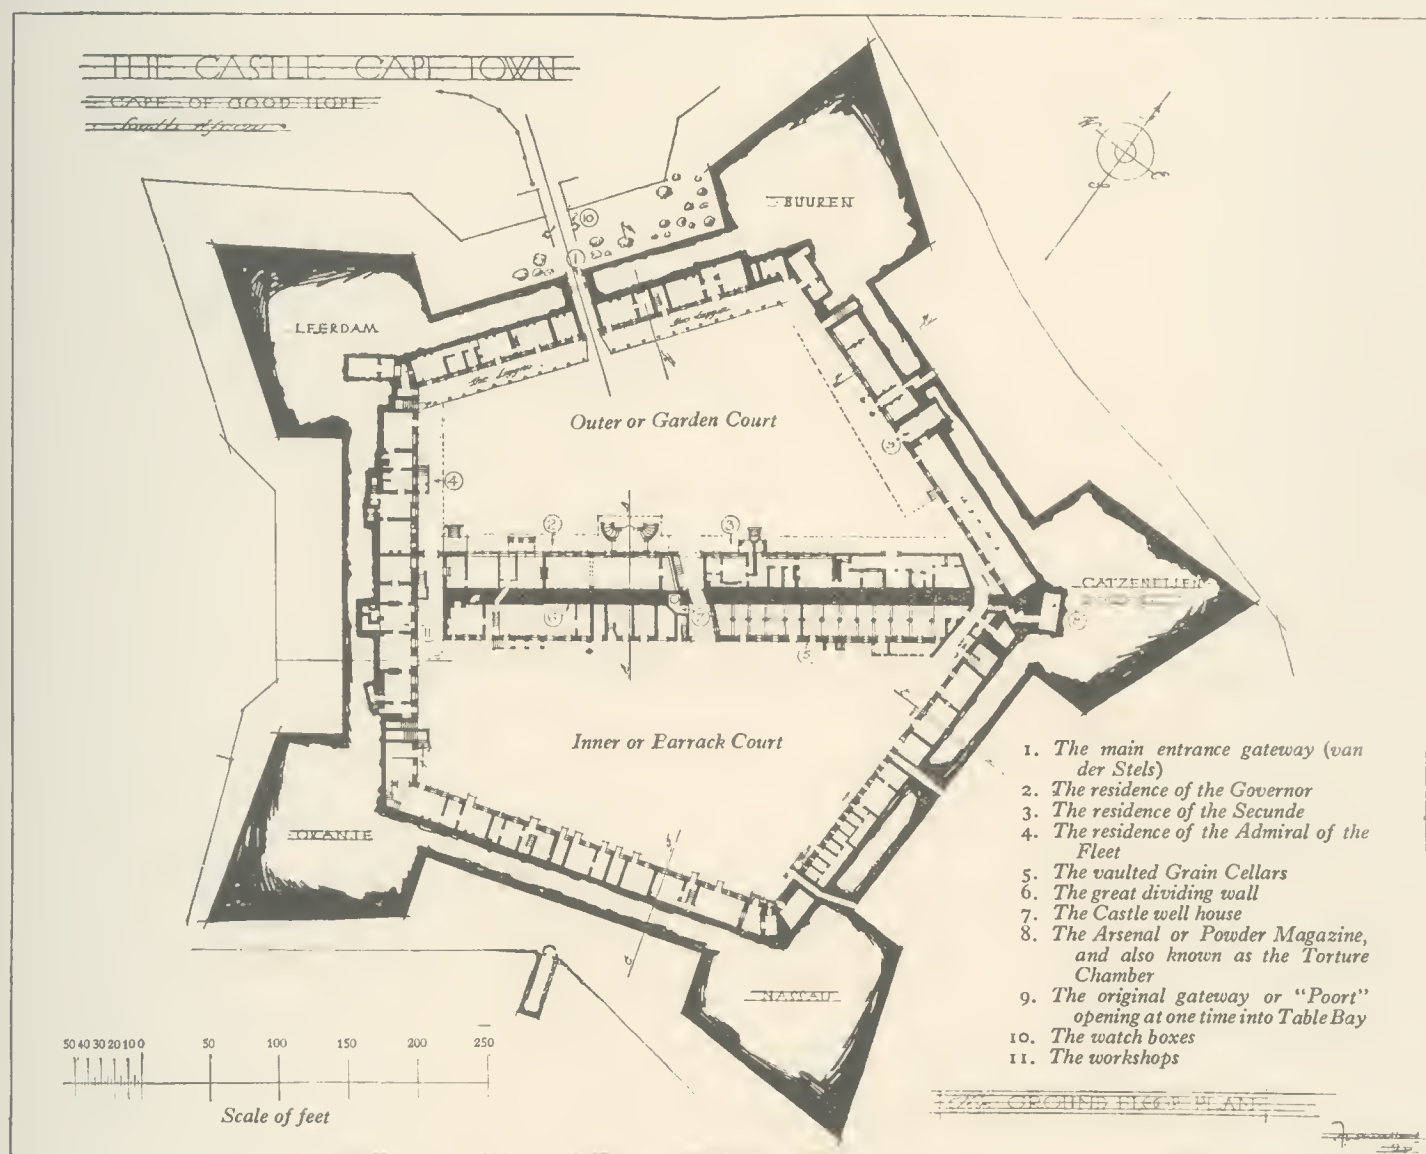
PLAN OF THE CASTLE, CAPE TOWN
